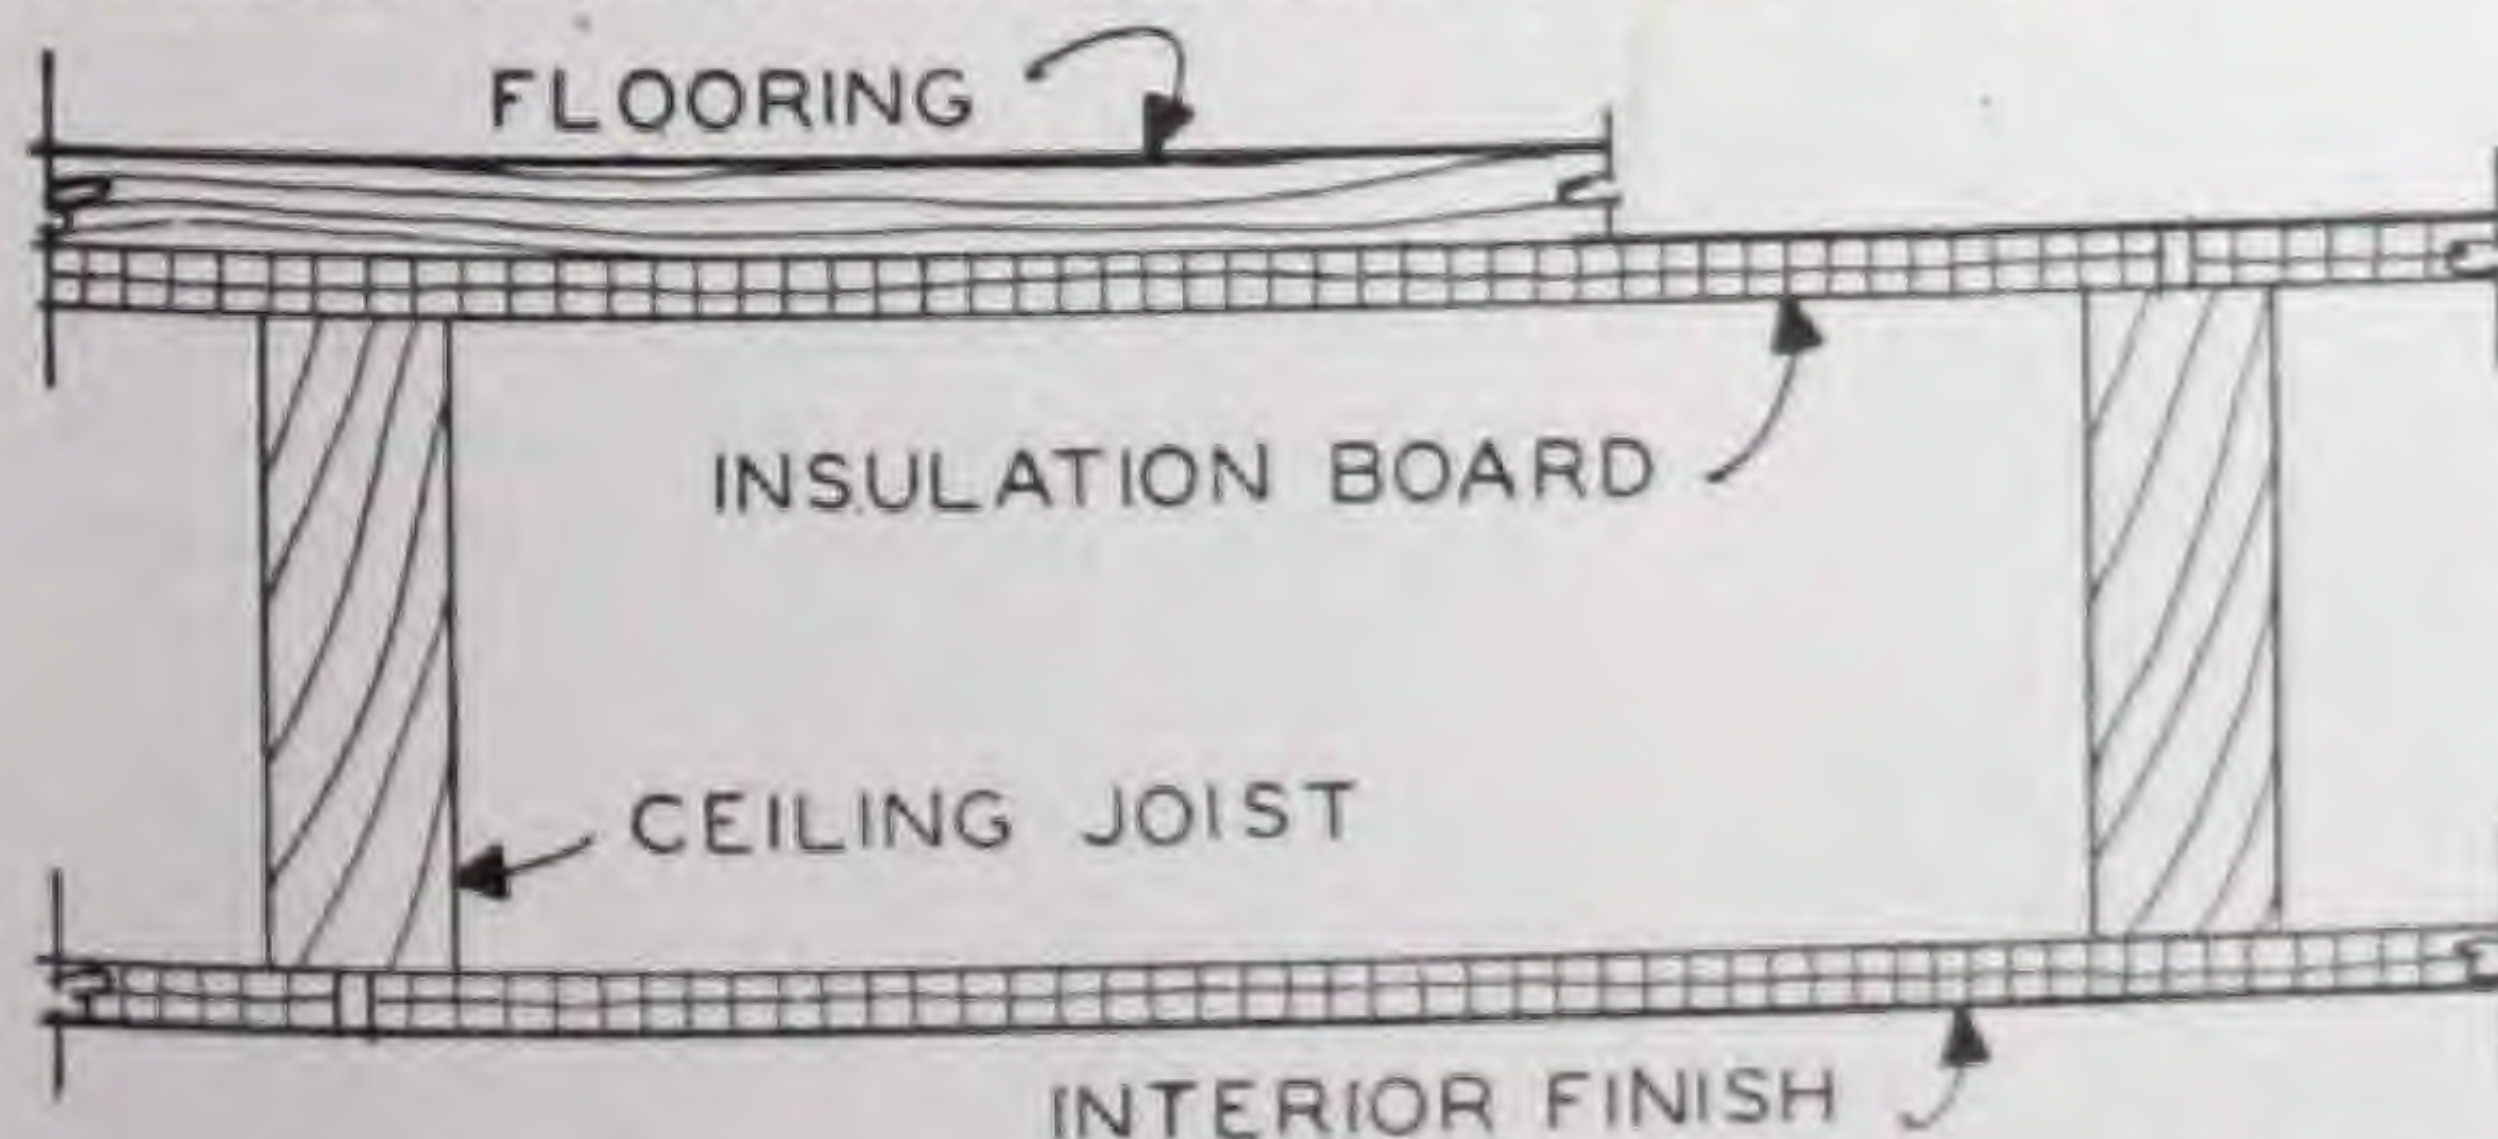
Insulating board on top of ceiling joists, with or without flooring with interior finish of insulation board or other materials. (Note: Flooring must be applied over insulation board where attic floor is to be used.)
